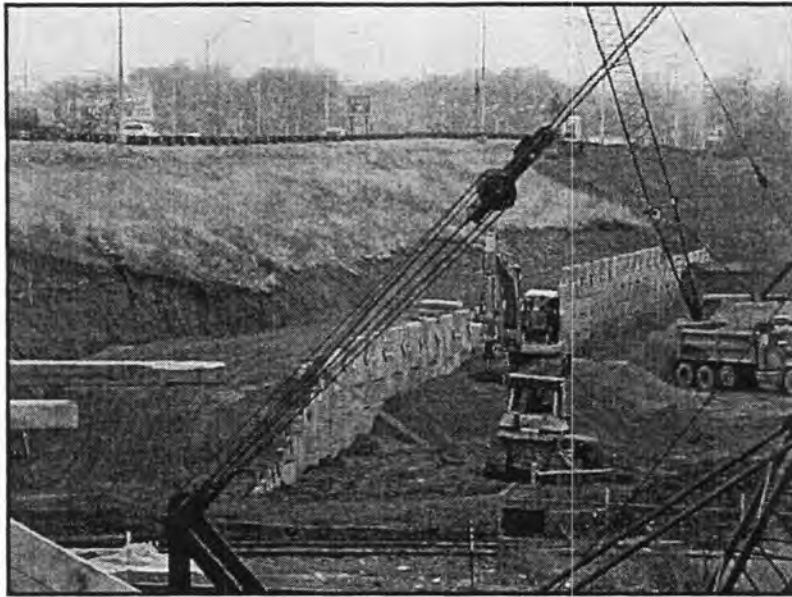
Picture showing MSE wall at 3rd St Bridge (North of I-235)
